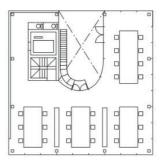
Floor plans, Shibaura house, SANAA (2011) • Source: El Croquis
